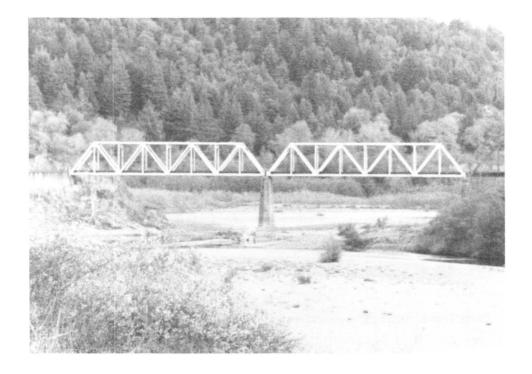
Railroad bridge across South Fork Eel River at Scotia.
